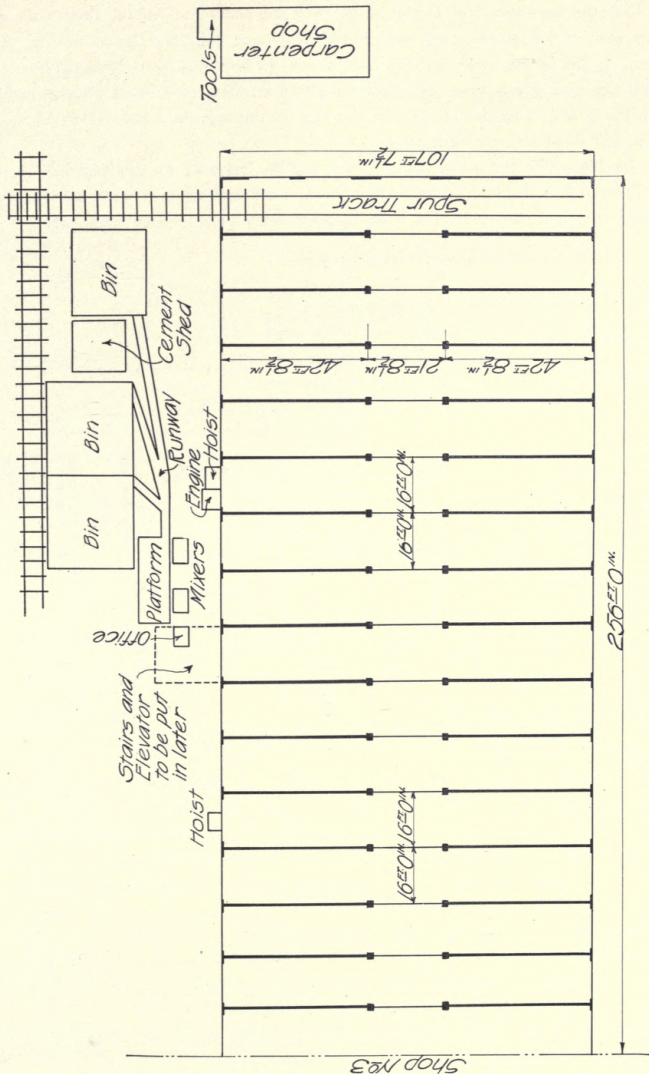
Plan of Machine Shop, with Construction Plant. (See p. 96.)
